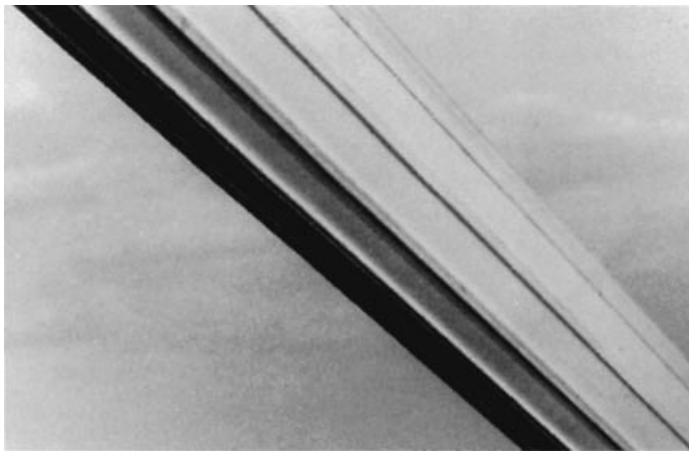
Pattern-indentated HDPE tubing used on Sutong and Stonecutters Bridges
